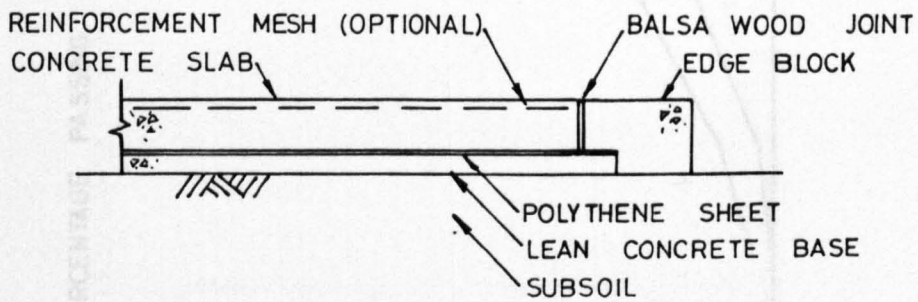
CROSS SECTION OF A MODEL CONCRETE PAVEMENT
